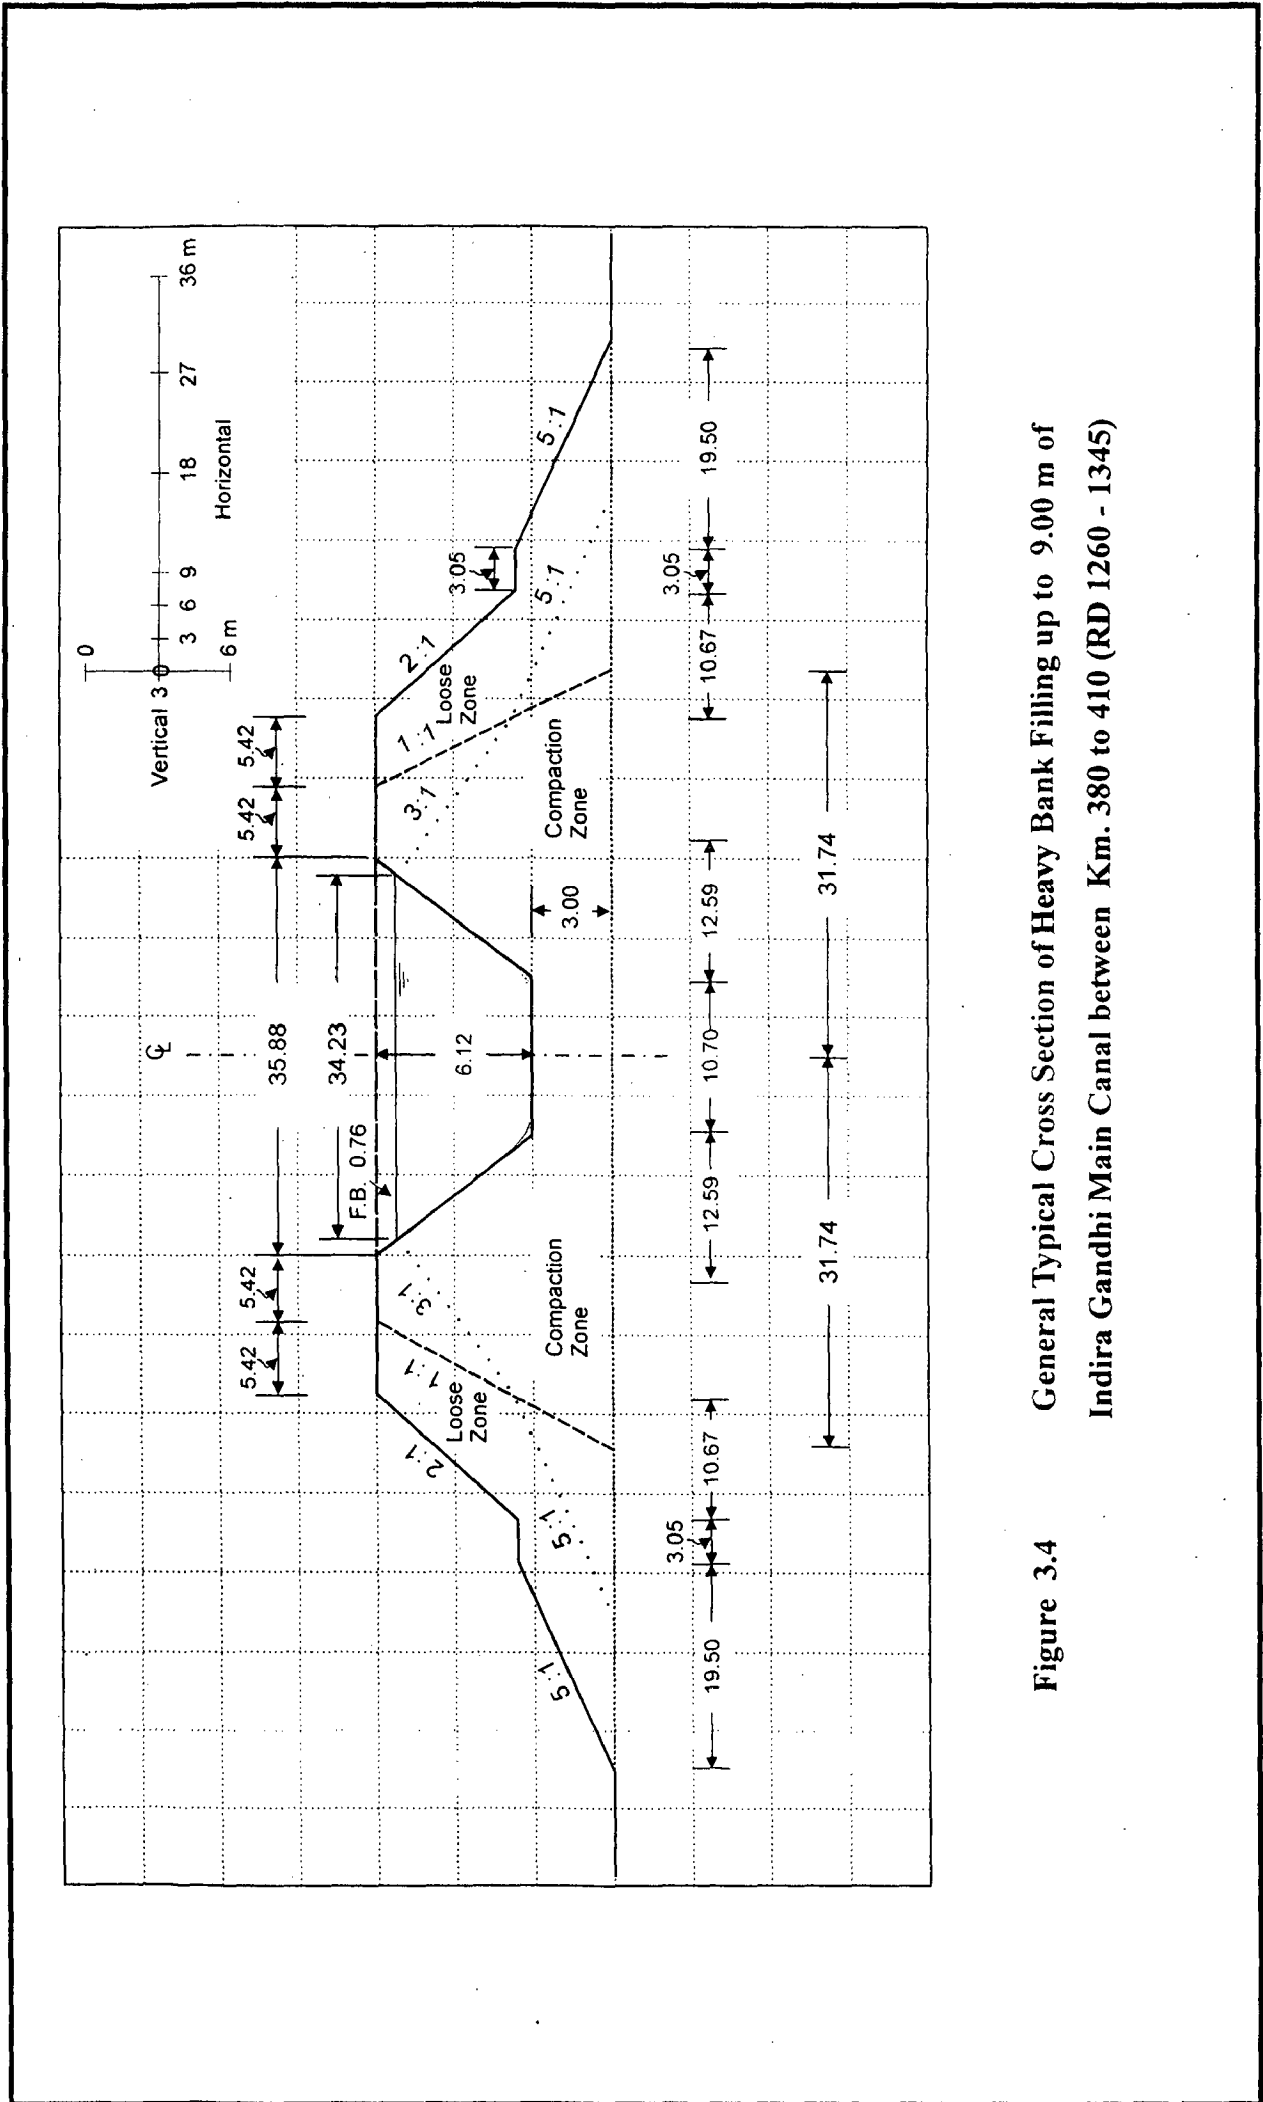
General Typical Cross Section of Heavy Bank Filling up to 9.00 m of Indira Gandhi Main Canal between Km. 380 to 410 (RD 1260 - 1345)
